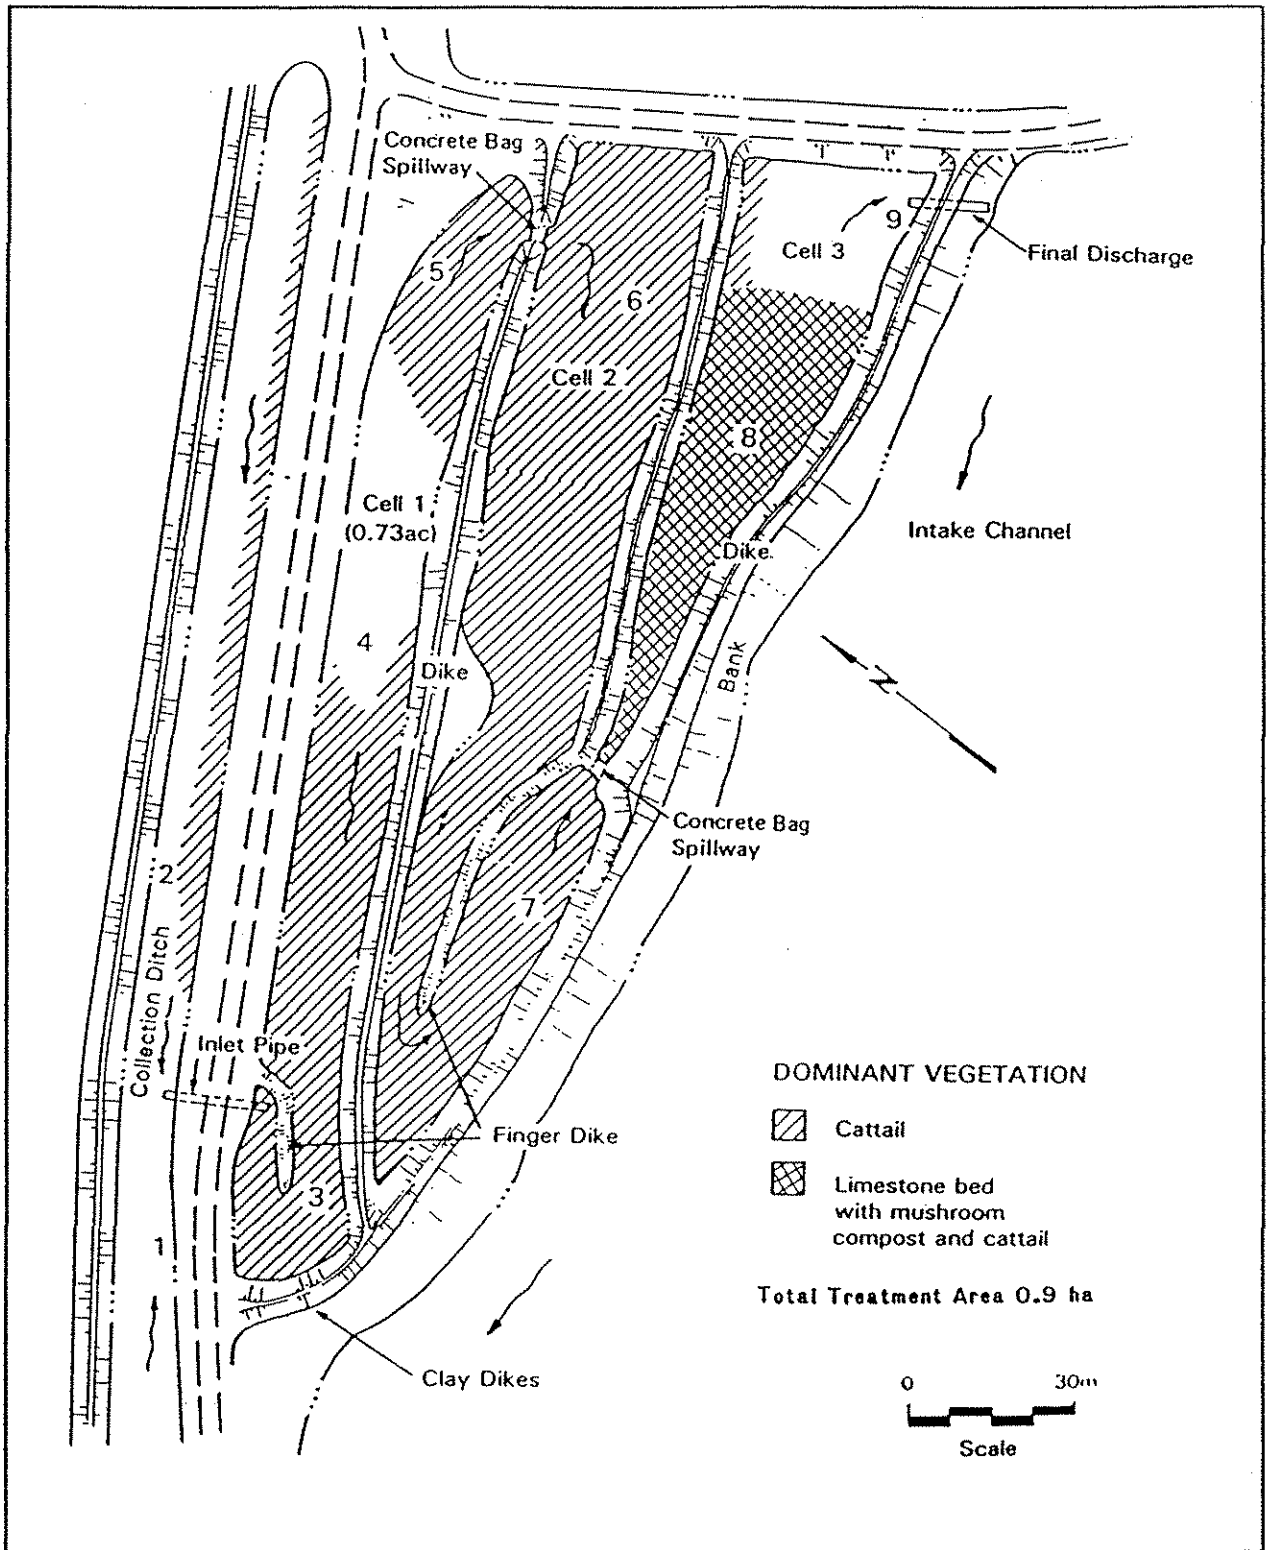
Typical layout of a multi-cell treatment wetland (Adapted from Brodie, et. al., 1989).
